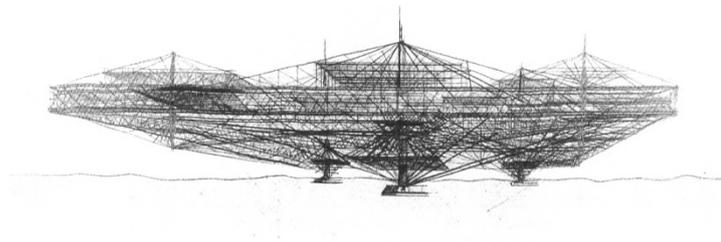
New Babylon : Sketch for Self-supporting Sector construction
